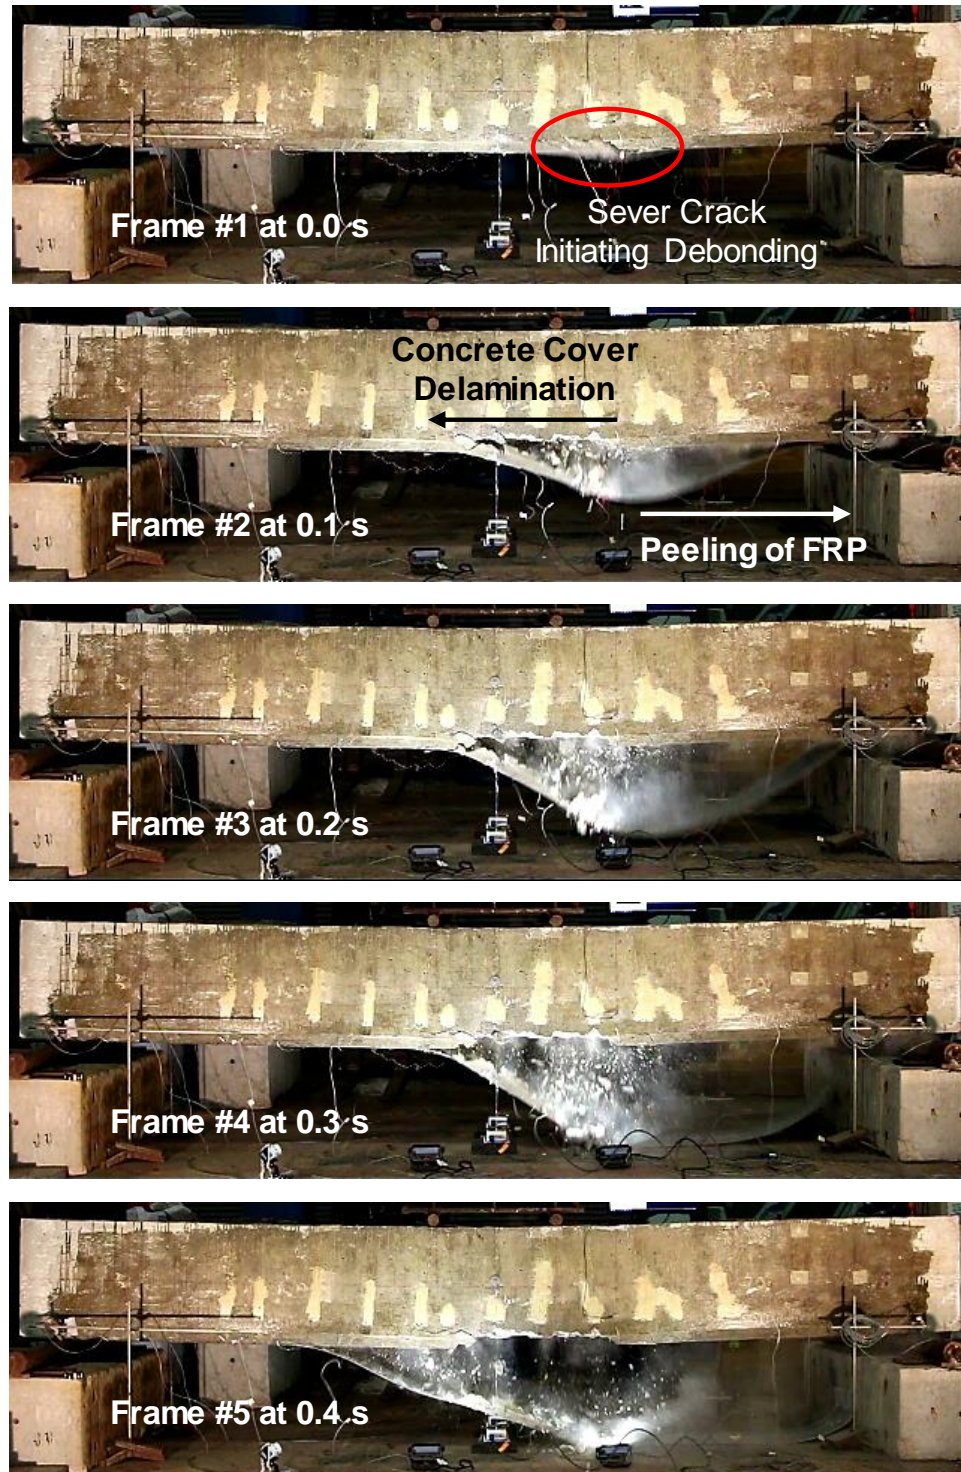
Snapshots showing the progressive debonding of the GFRP composite patch at the failure of the concrete beam specimen.
